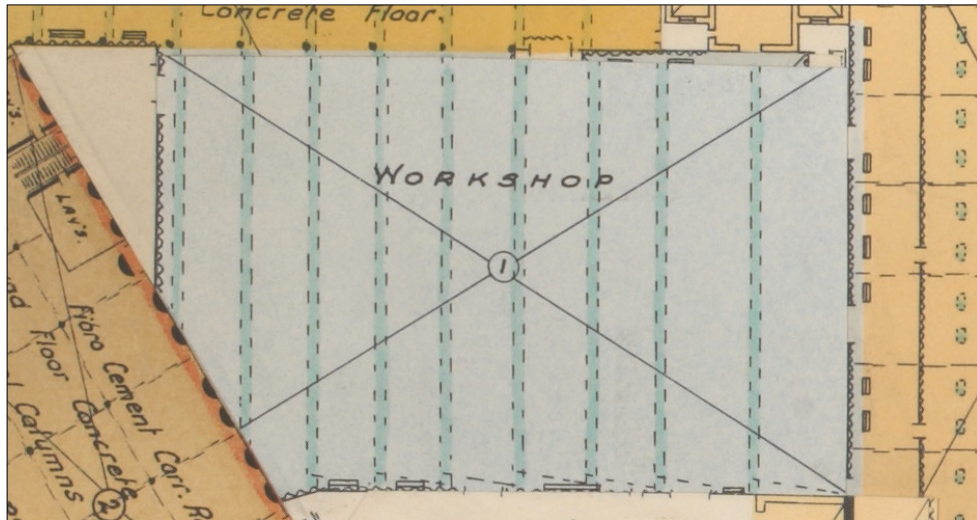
Part of a c1950 fire insurance plan showing the plan form of Building 875. The blue shading designates 'galvanised iron & wood construction'. Source: State Library of Victoria.
